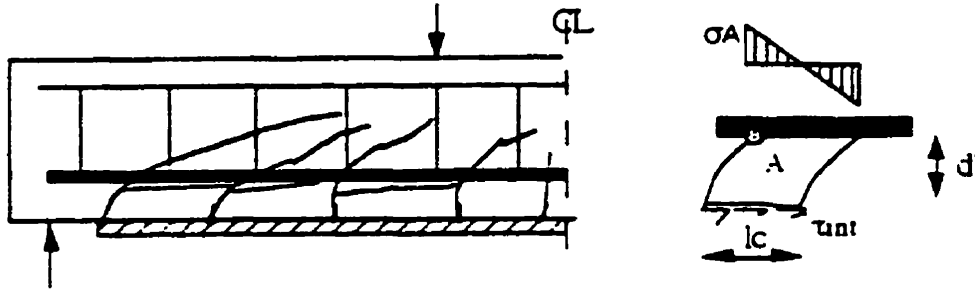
Cracked beam and concrete tooth acting as cantilever beam [21]
